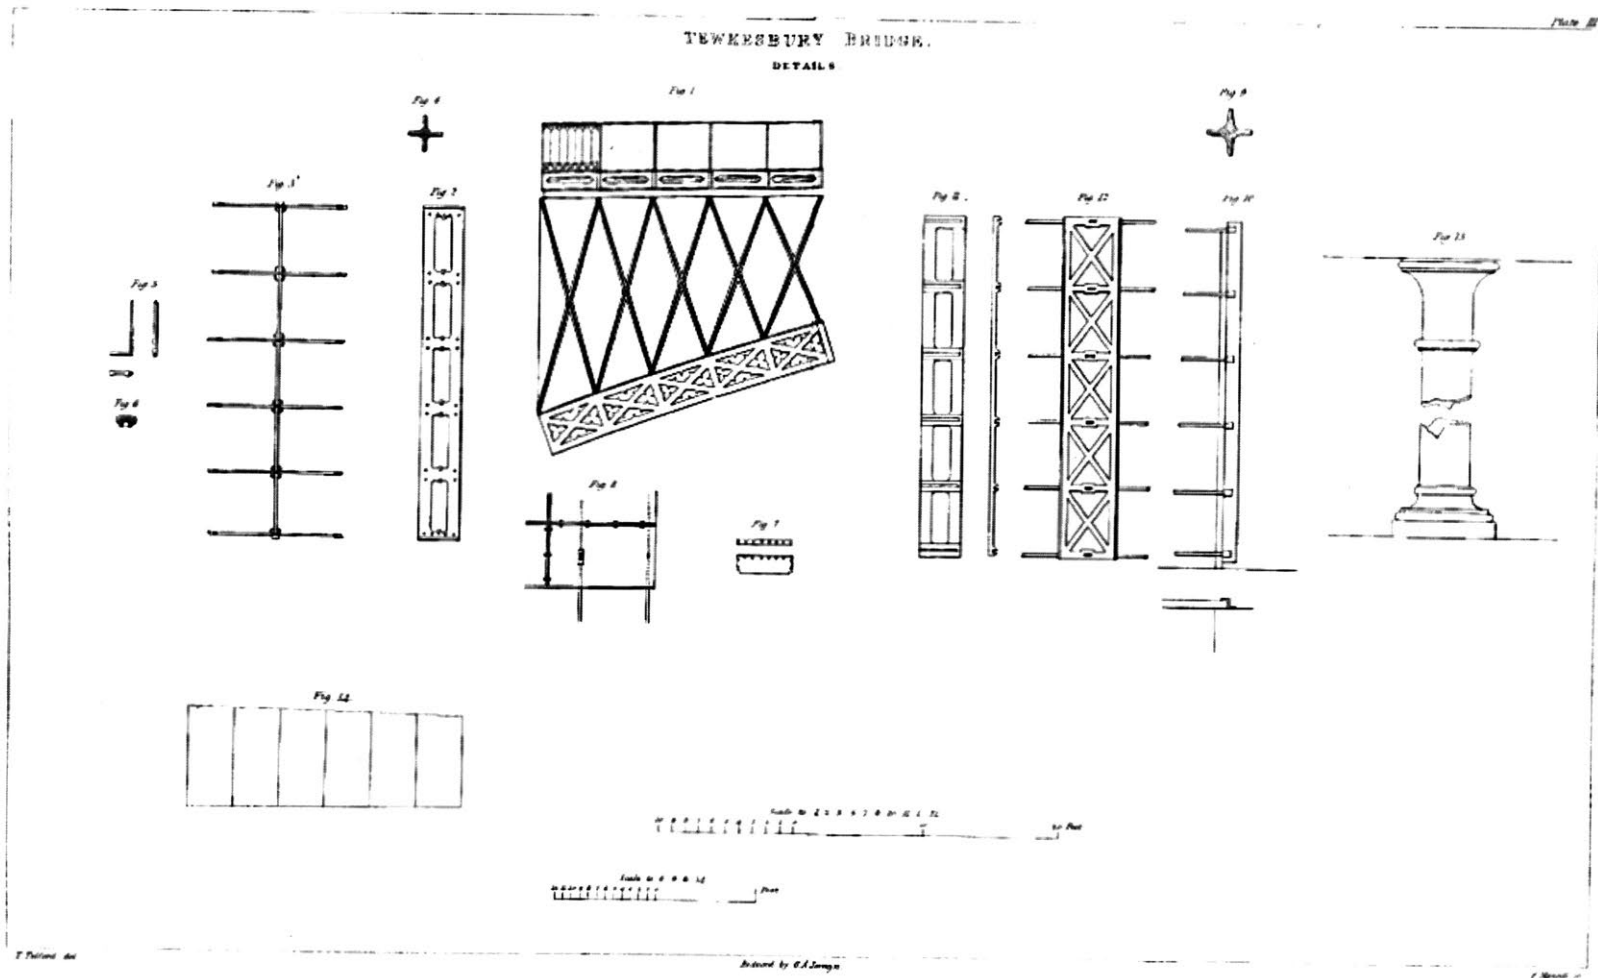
Telford's original drawings of Mythe Bridge - ironwork details (Mackenzie)
